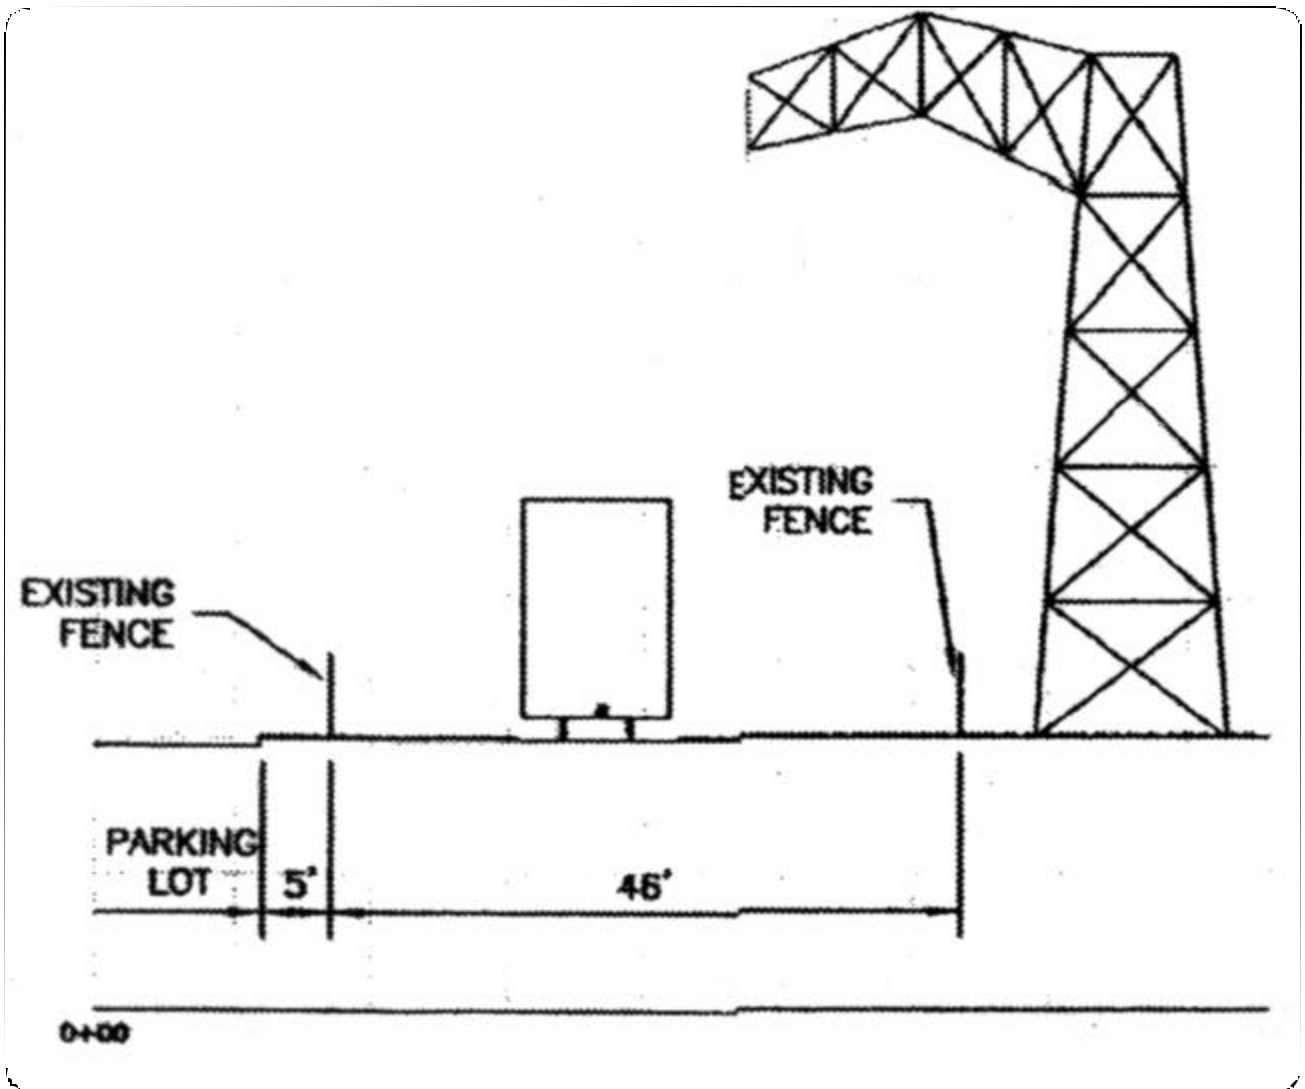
Existing street section of 46th Street between Hiawatha and 36th Avenue, facing east.
